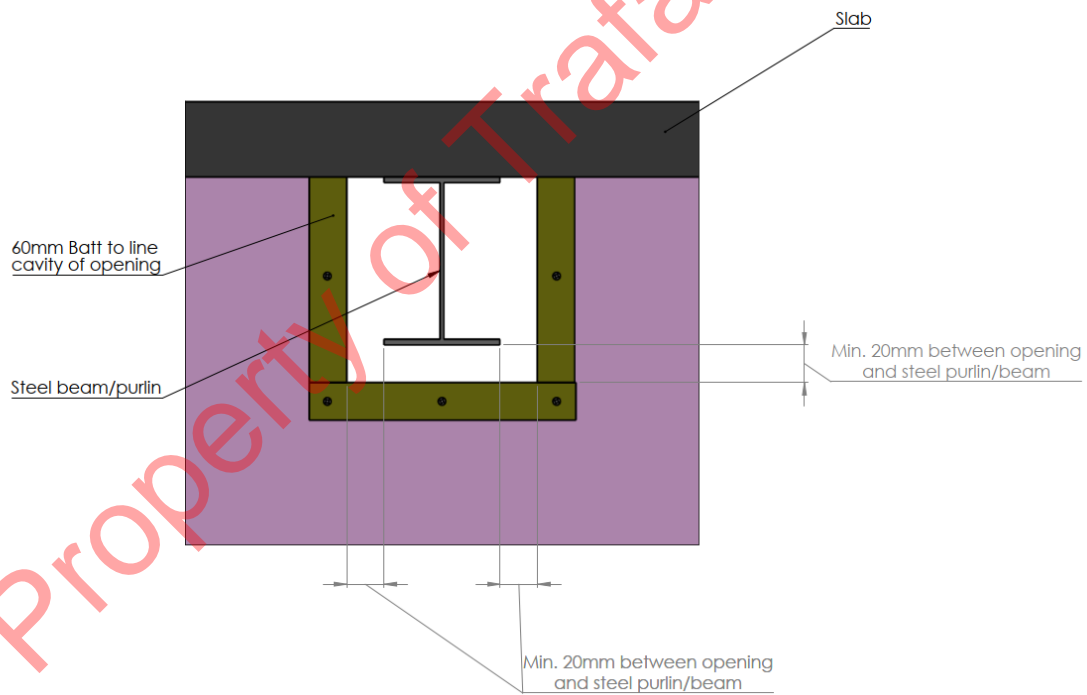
Proposed steel beam/purlin penetration system – cross section with FyreBATT lining
